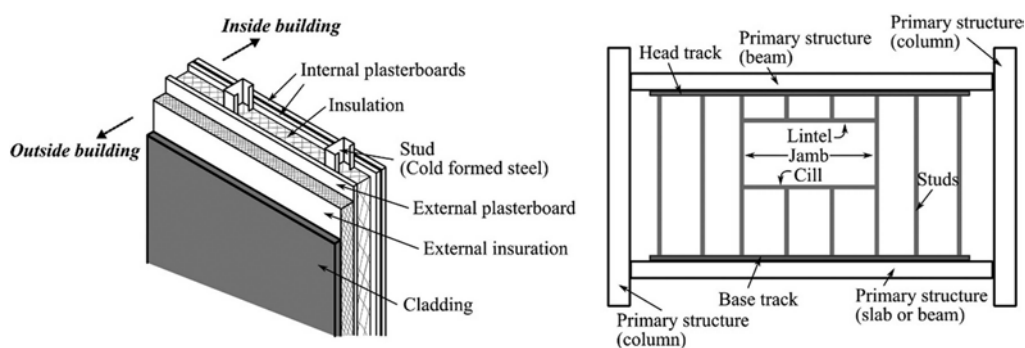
Exterior infill wall: (left) notations of infill wall components; (right) notations of lightweight cold-formed steel members and surrounding primary structure.
